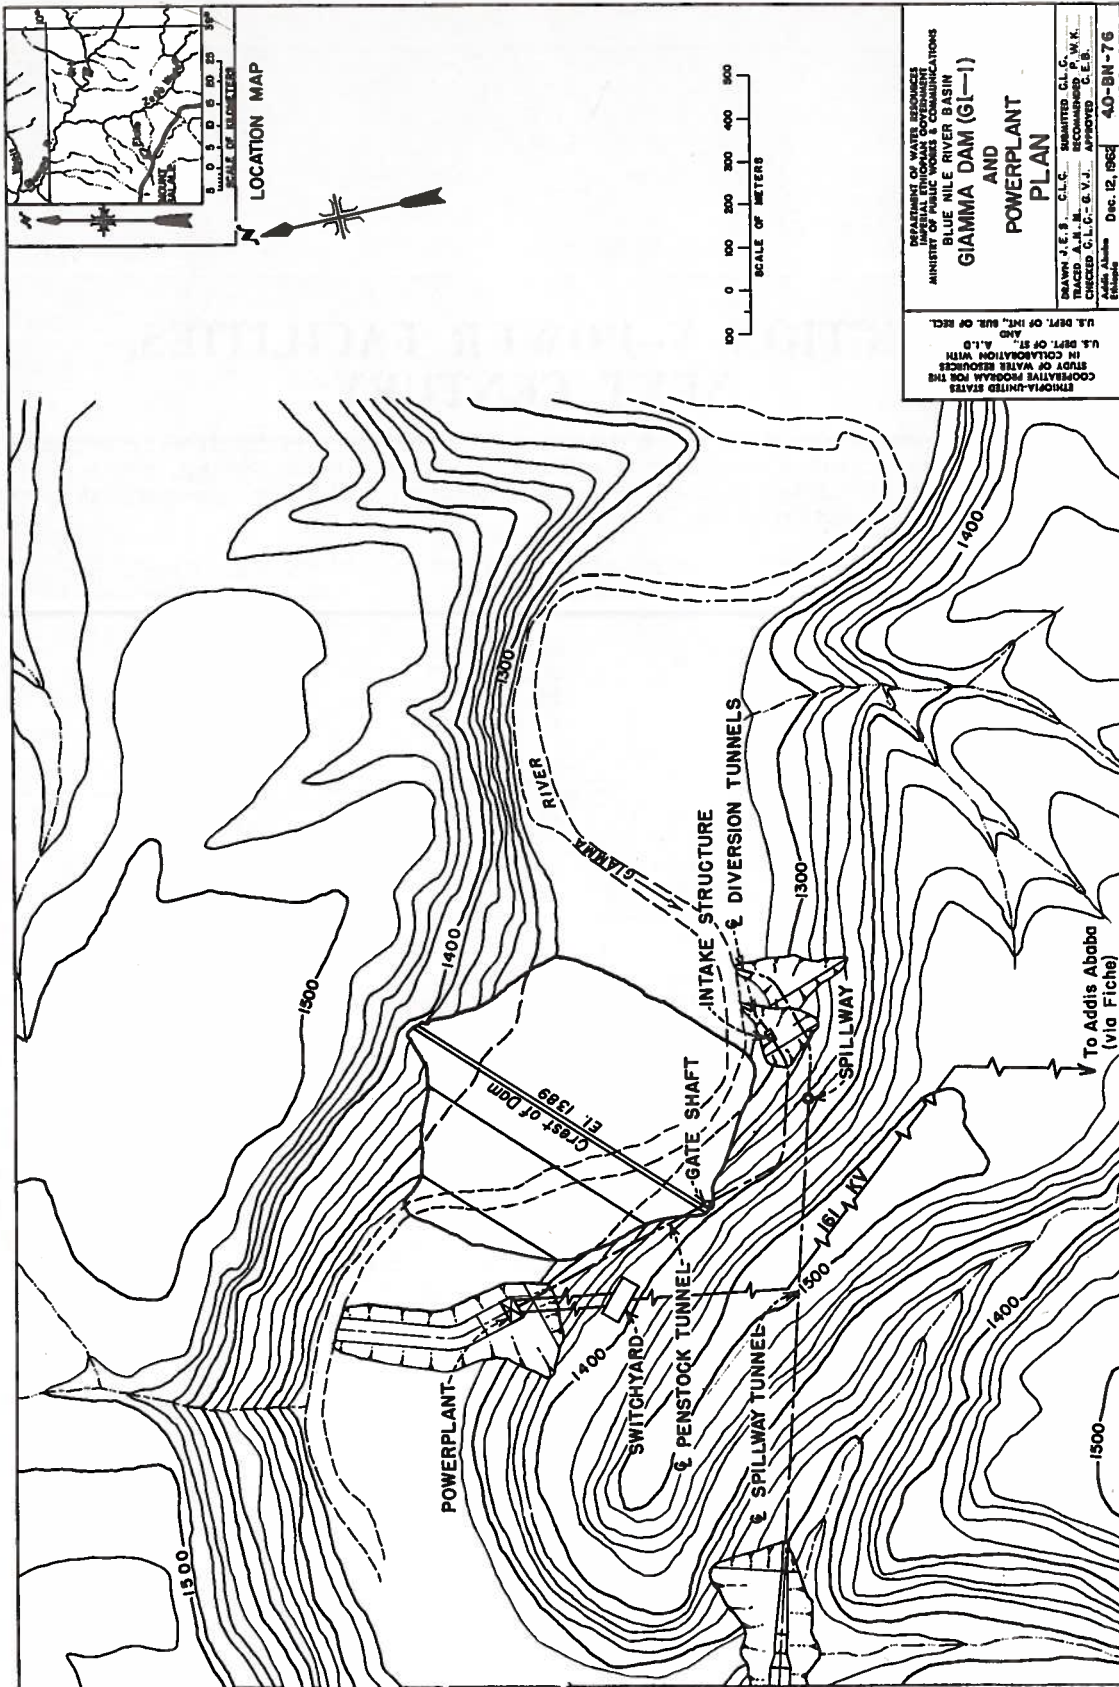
Giamma Dam (GI-1) and Powerplant--Plan
